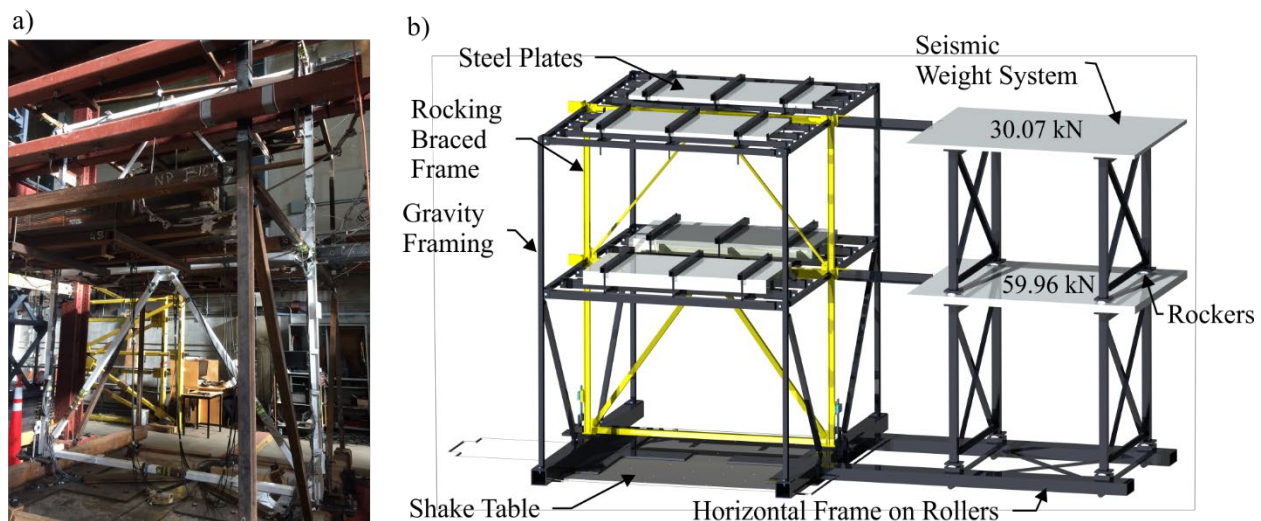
Test Setup: a) Test specimen with gravity frame on the shake table; b) 3D view of the test specimen and the seismic weight system for the Montreal location.
